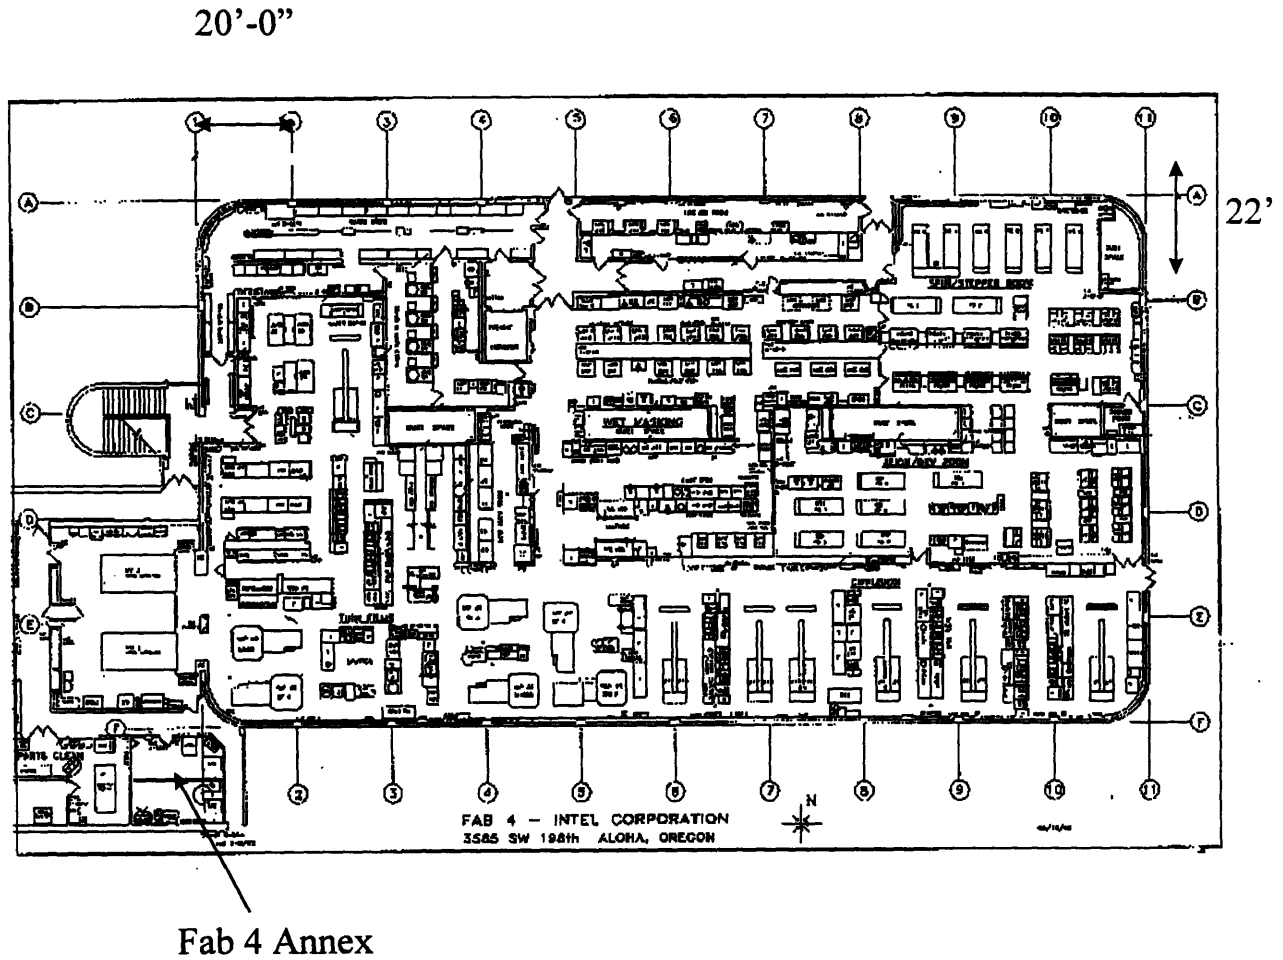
Fab 4 - Second Floor Fabrication Area Layout, June 1996
